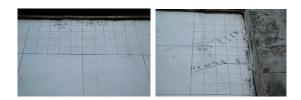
Cracks on shrinkage restricted concrete wall without w/o using shrinkage reducing agent
